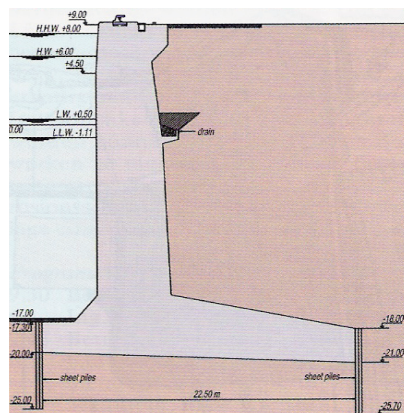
Cross-section of quay wall Deurganckdock I, Antwerp 2006 [Hansa 2008]
